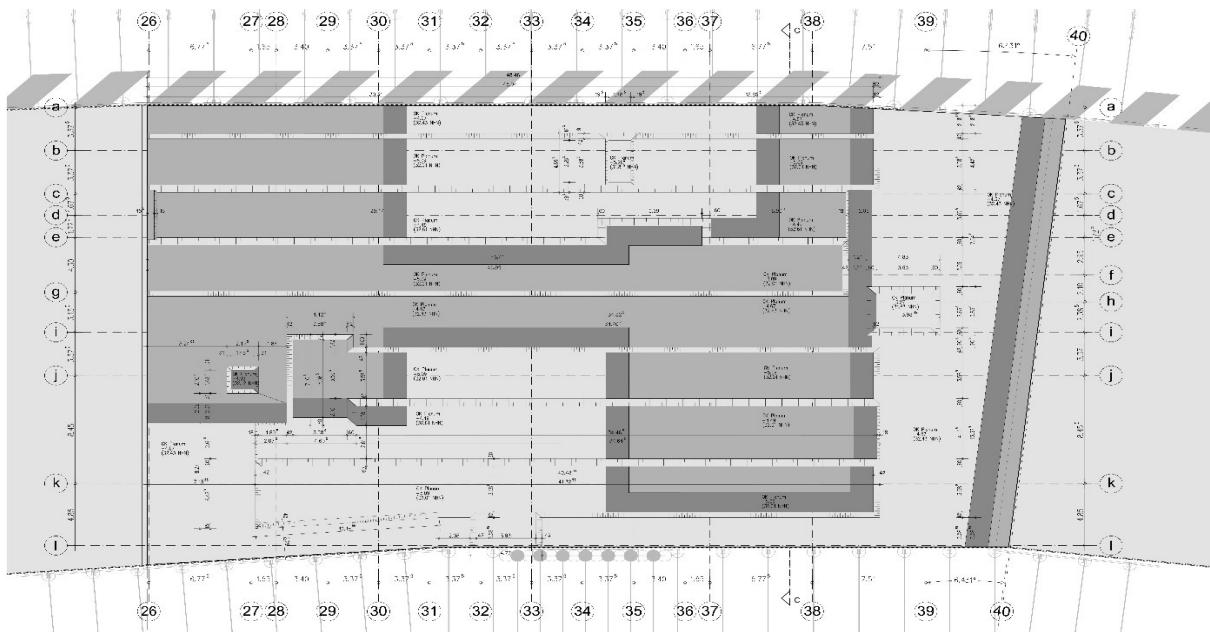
Single-layer horizontal decoupling (light grey), double-layer decoupling (medium grey) and transition (dark grey) in Building 2
